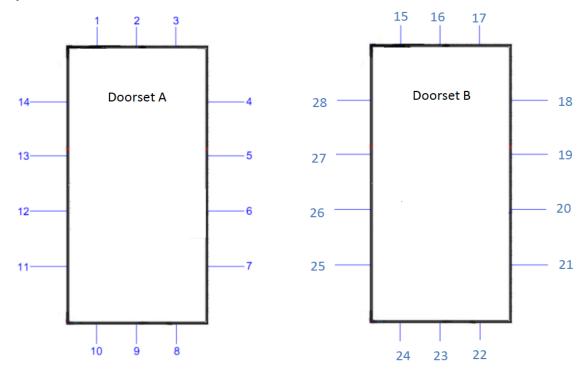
Initial Clearance Measurement Positions (View from unexposed side)
